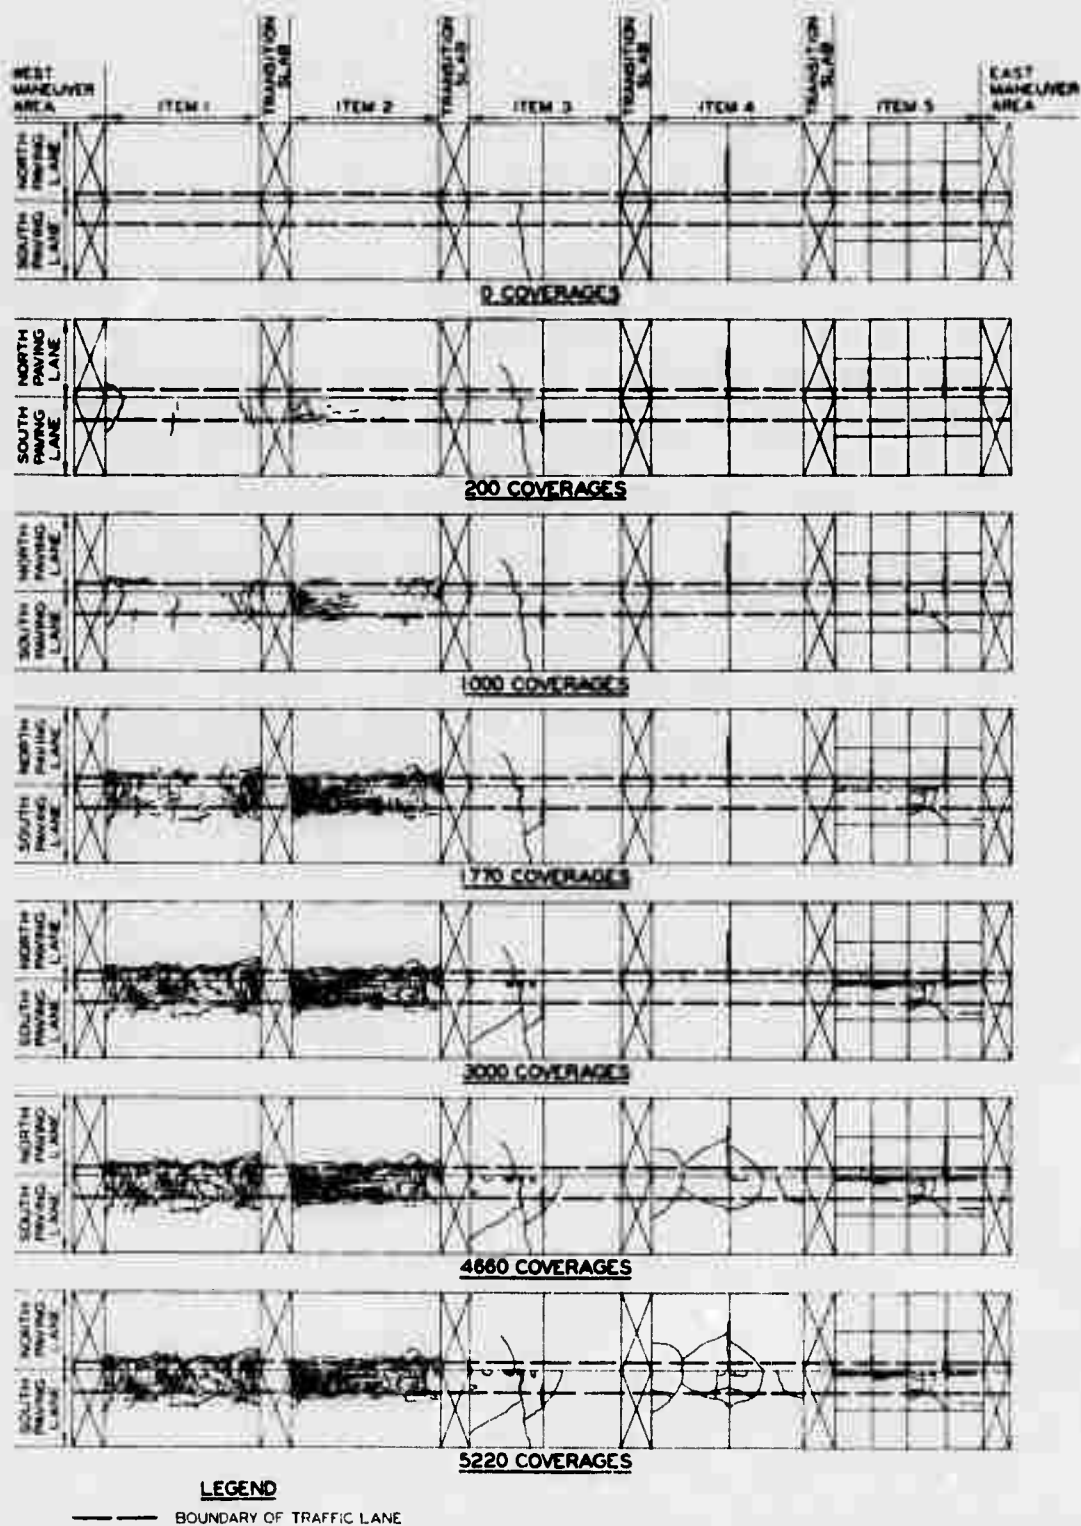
Crack development in lane 1, rigid pavement test section
